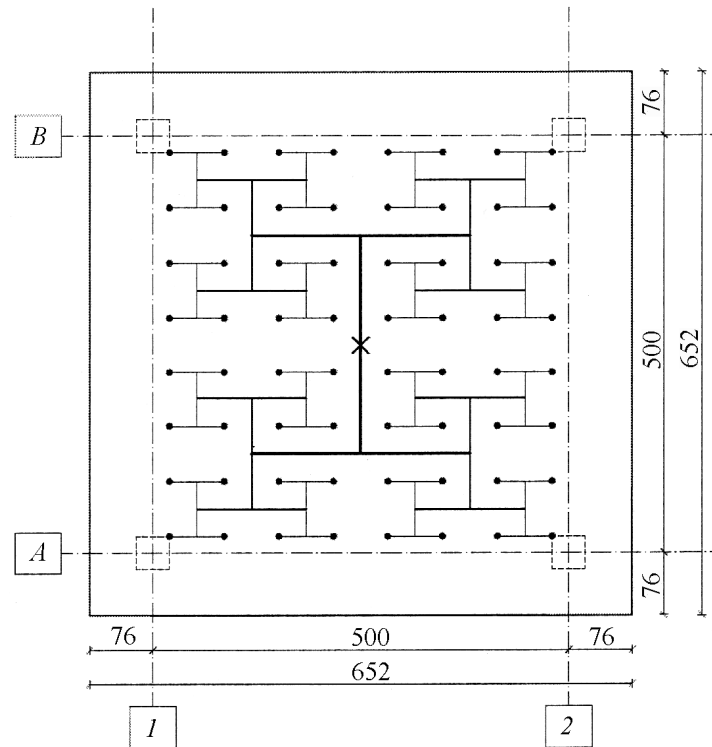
Loading sketch for Bubble Deck experimental element.
